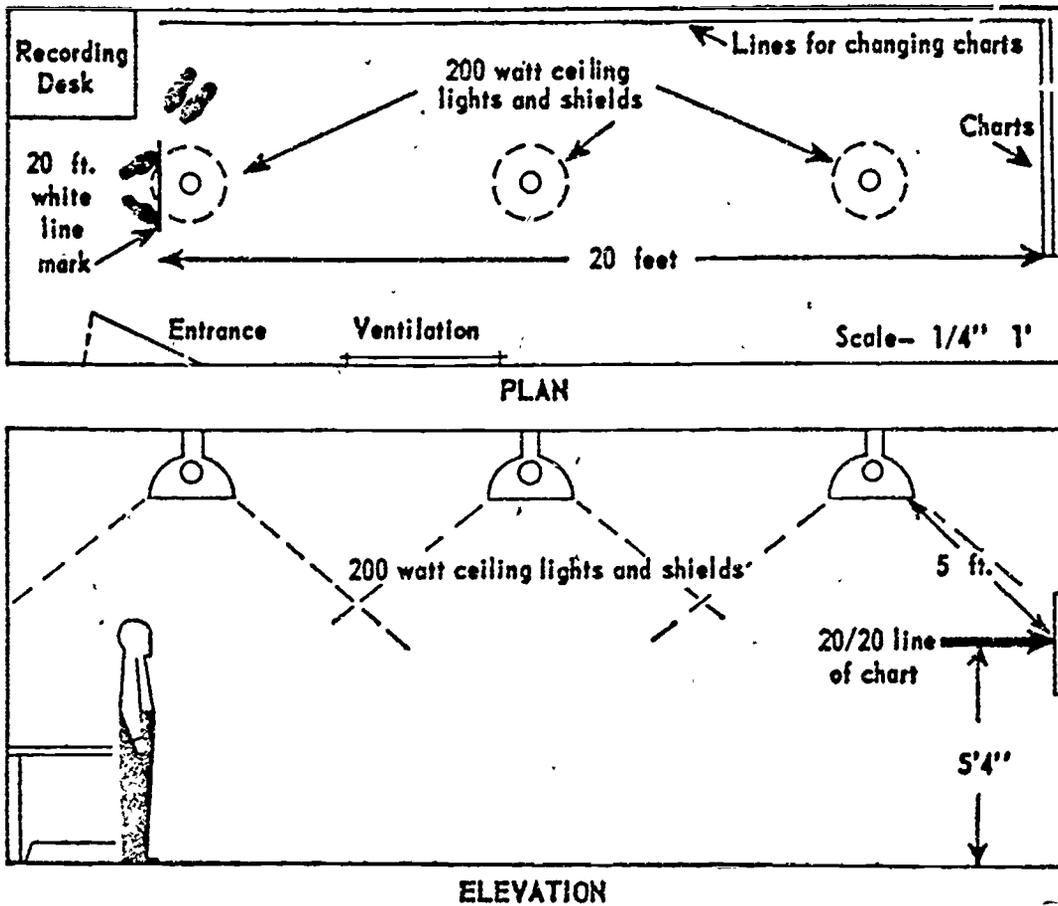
Room Plan - Essentials of Eye-Testing Room.
